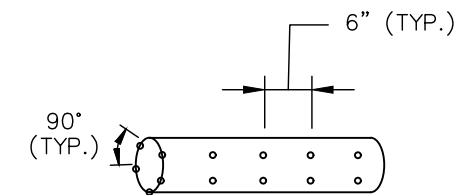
SCALE: N.T.S SHEET No. 04
